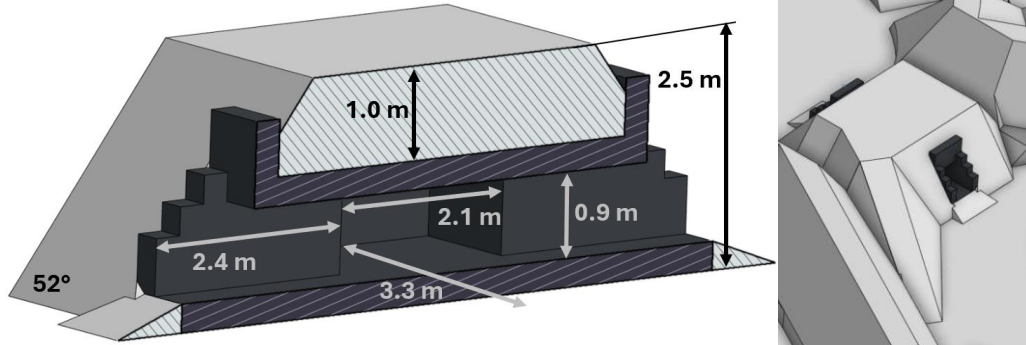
A cross-section view of the notionally designed protective shelter with dimensions (left) and a close-up view of the shelter in the Park (right).
